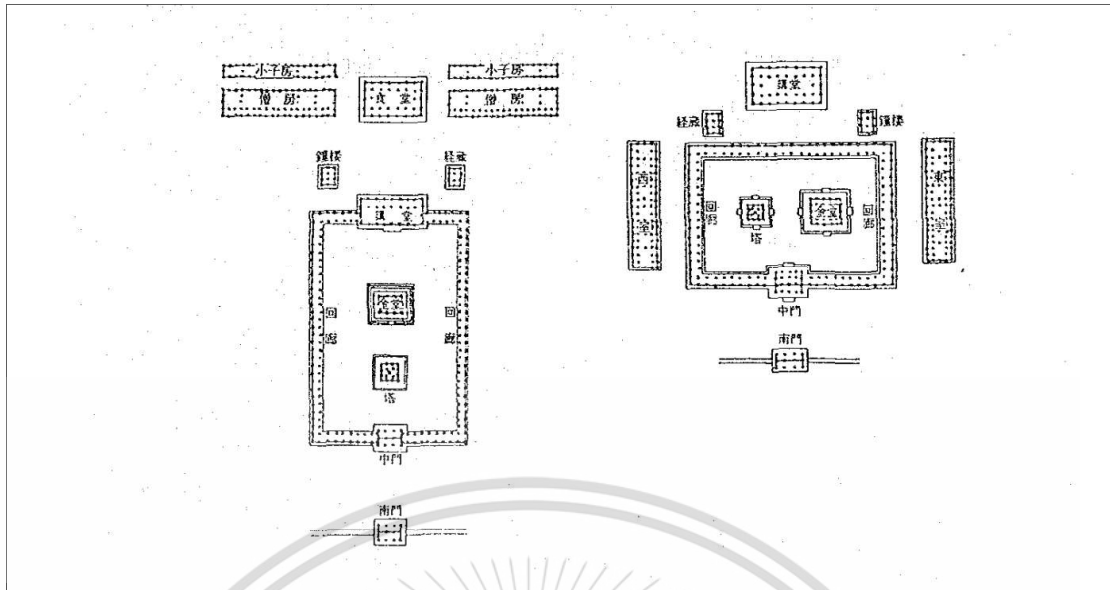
3: The Garan Haichi (伽藍配置) layouts
